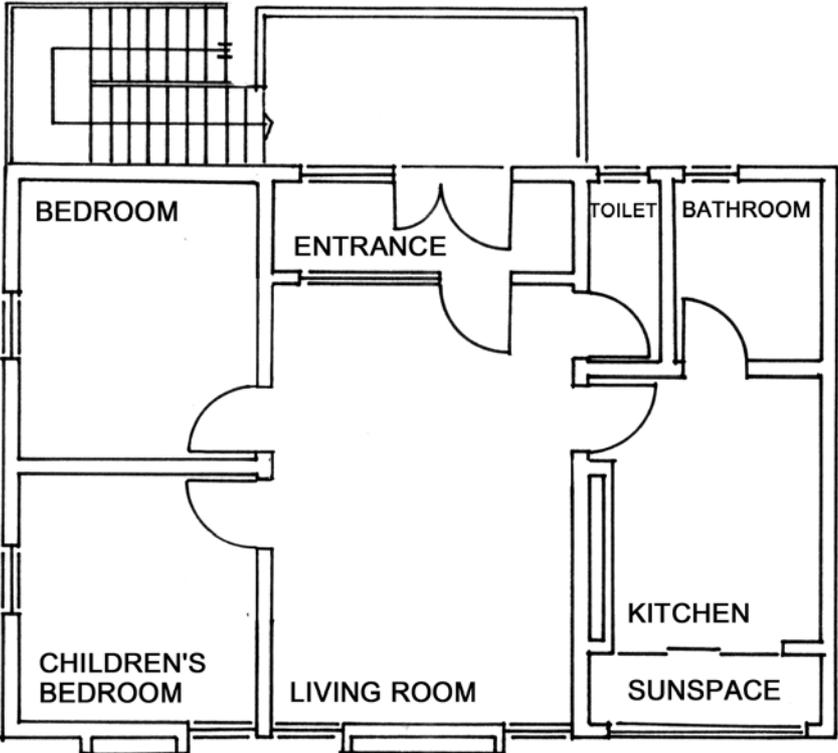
Plan of type D₃ dwelling (house with depot on the ground floor); Scale 1/100
